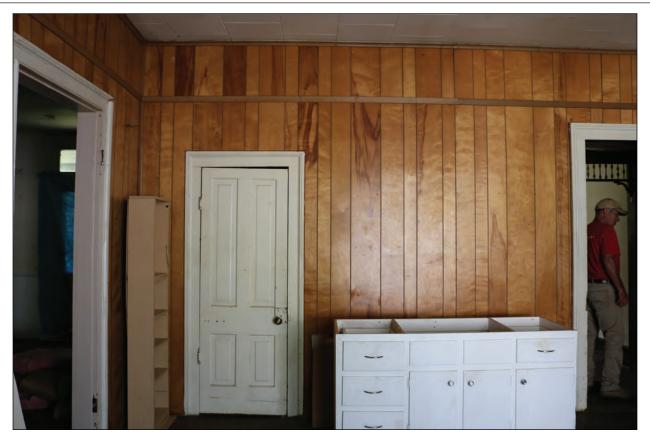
Hugh A. Keith House, Façade, Added Paneling in the Original Dining Room.
